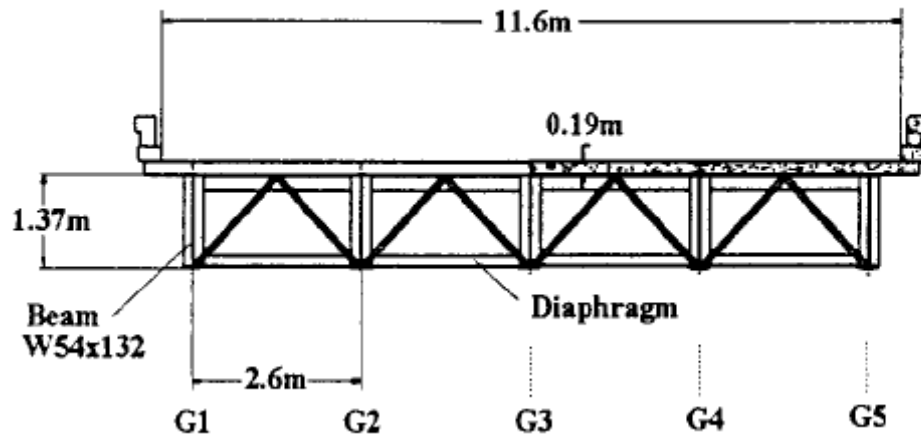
Front view (Cross-section) of Walnut Creek Bridge (Courtesy: Patten et al. [79])
